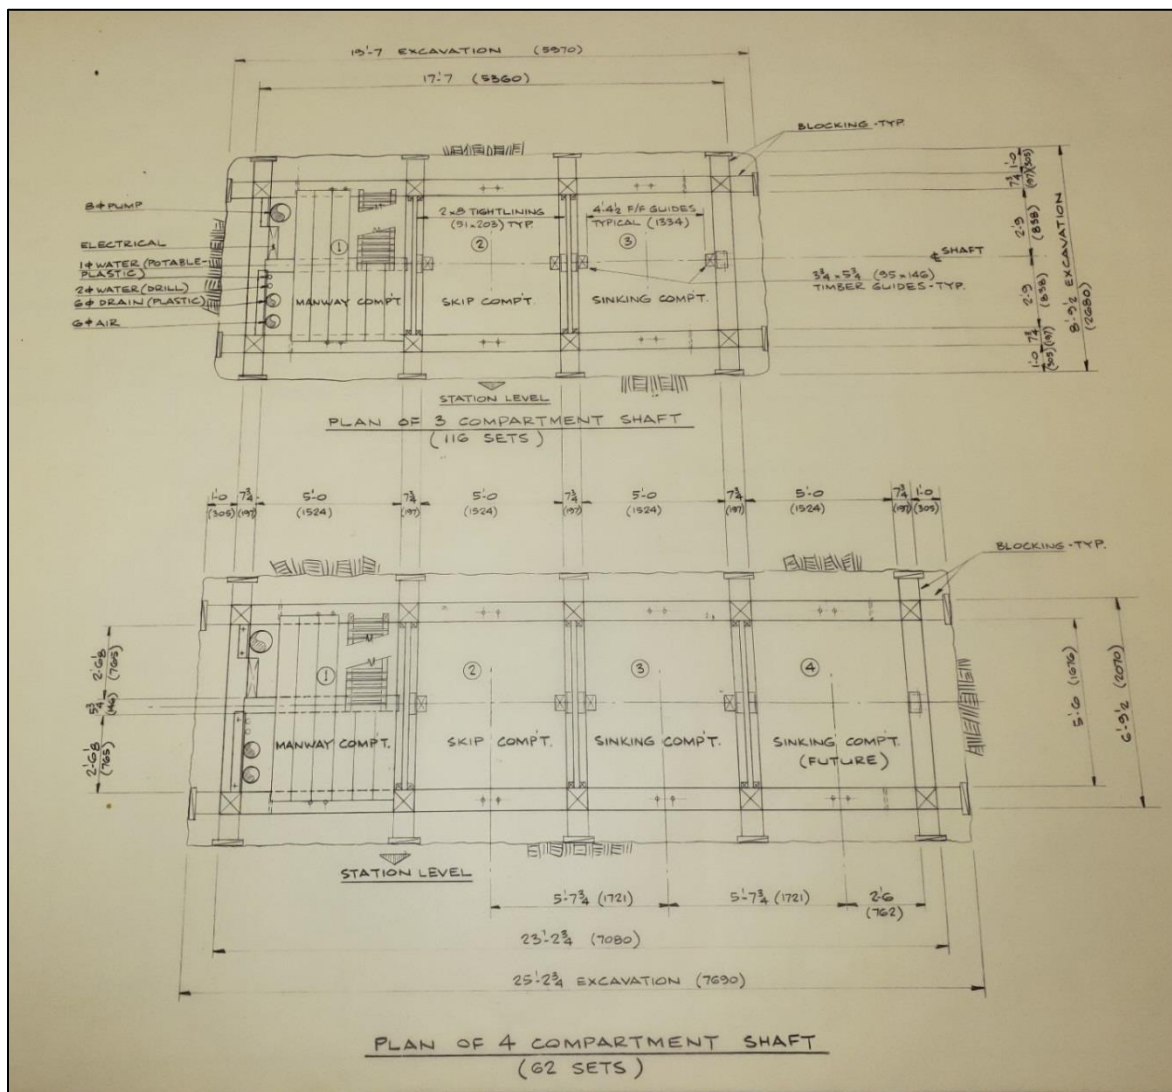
Chimo shaft plan – Drawing 4083-21-01-2000-1
